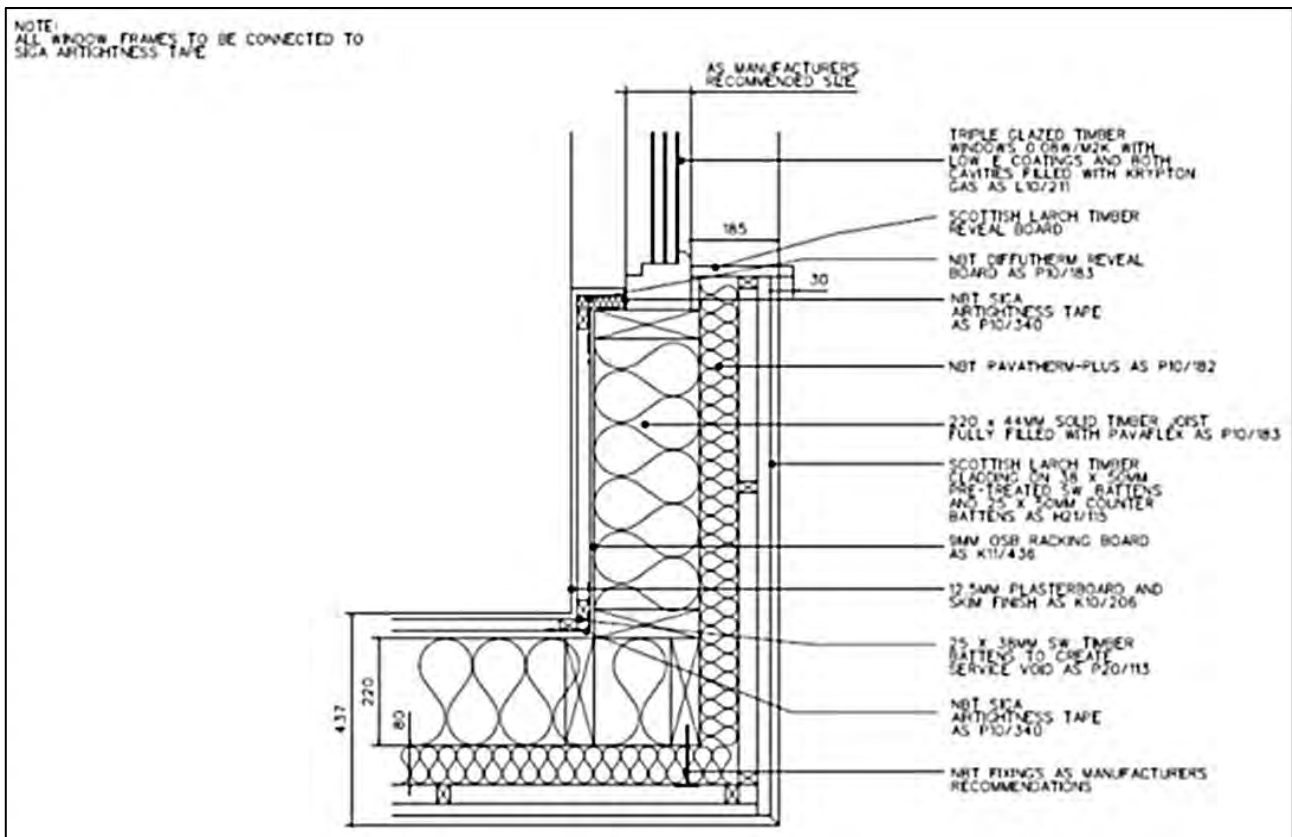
Construction Drawing, Apartment External Wall to Party Floor Detail (19 May 2011)
